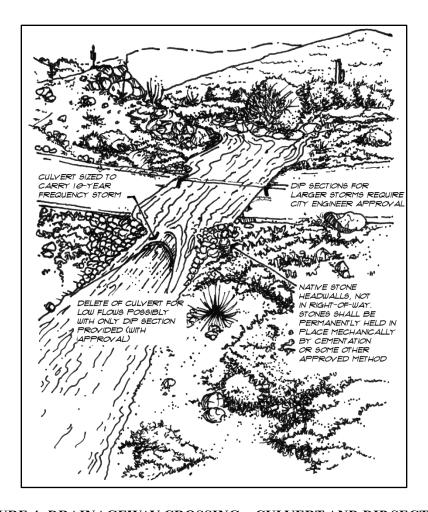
DRAINAGEWAY CROSSING - CULVERT AND DIP SECTION
